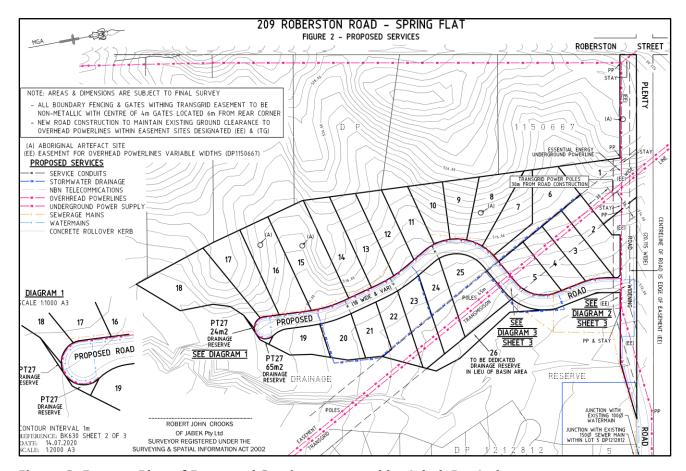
Excerpt Plan of Proposed Services prepared by Jabek Pty Ltd
